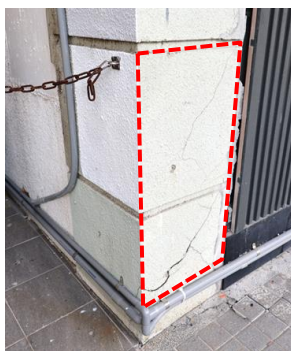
Inclined cracks at base of exterior column of Building A11-1.
